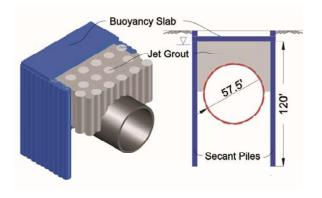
Tunnel Boring Machine ground improvements and horizontal containment
